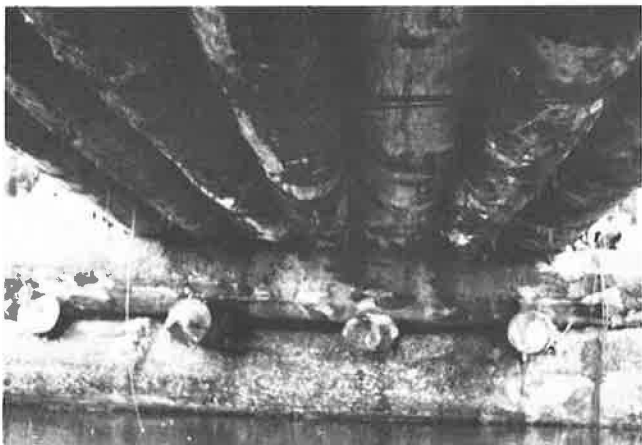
Native log stringer bridge in southeast Alaska: Span--28 m (92 ft); Capacity--72.5 Mg (80 tons).
